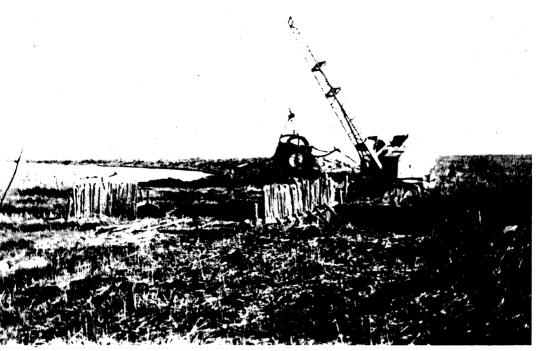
Ditch plug construction with a three-quarter yard dragline in diking work at Tuckahoe, New Jersey. Photo by L. G. MacNamara, New Jersey Department of Conservation.
